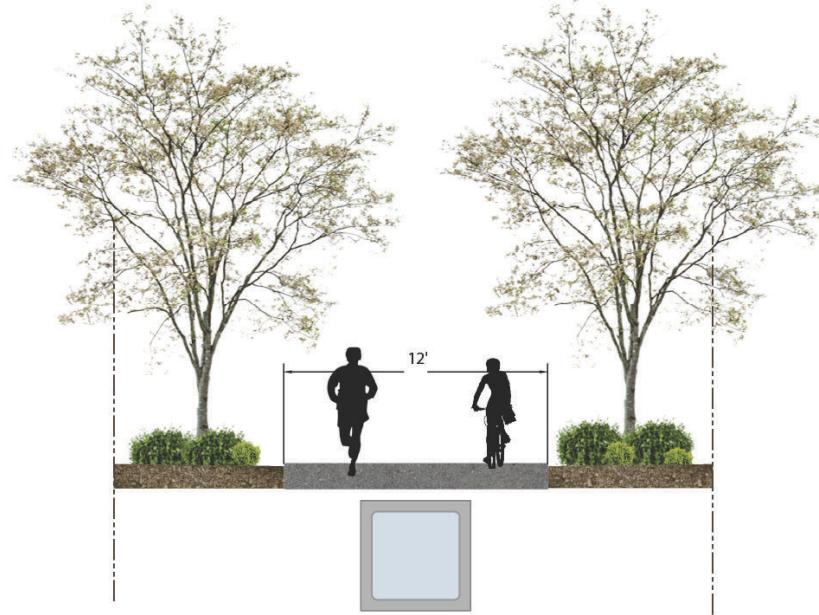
Jordan and Salt Lake City Canal Trail typical sections of trail over canal enclosure.
